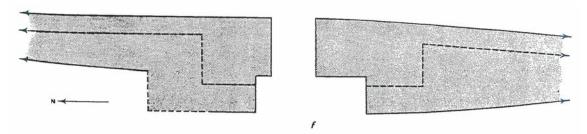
Plan drawing of Gate H (modified after Shook 1952:Figure 1f).
